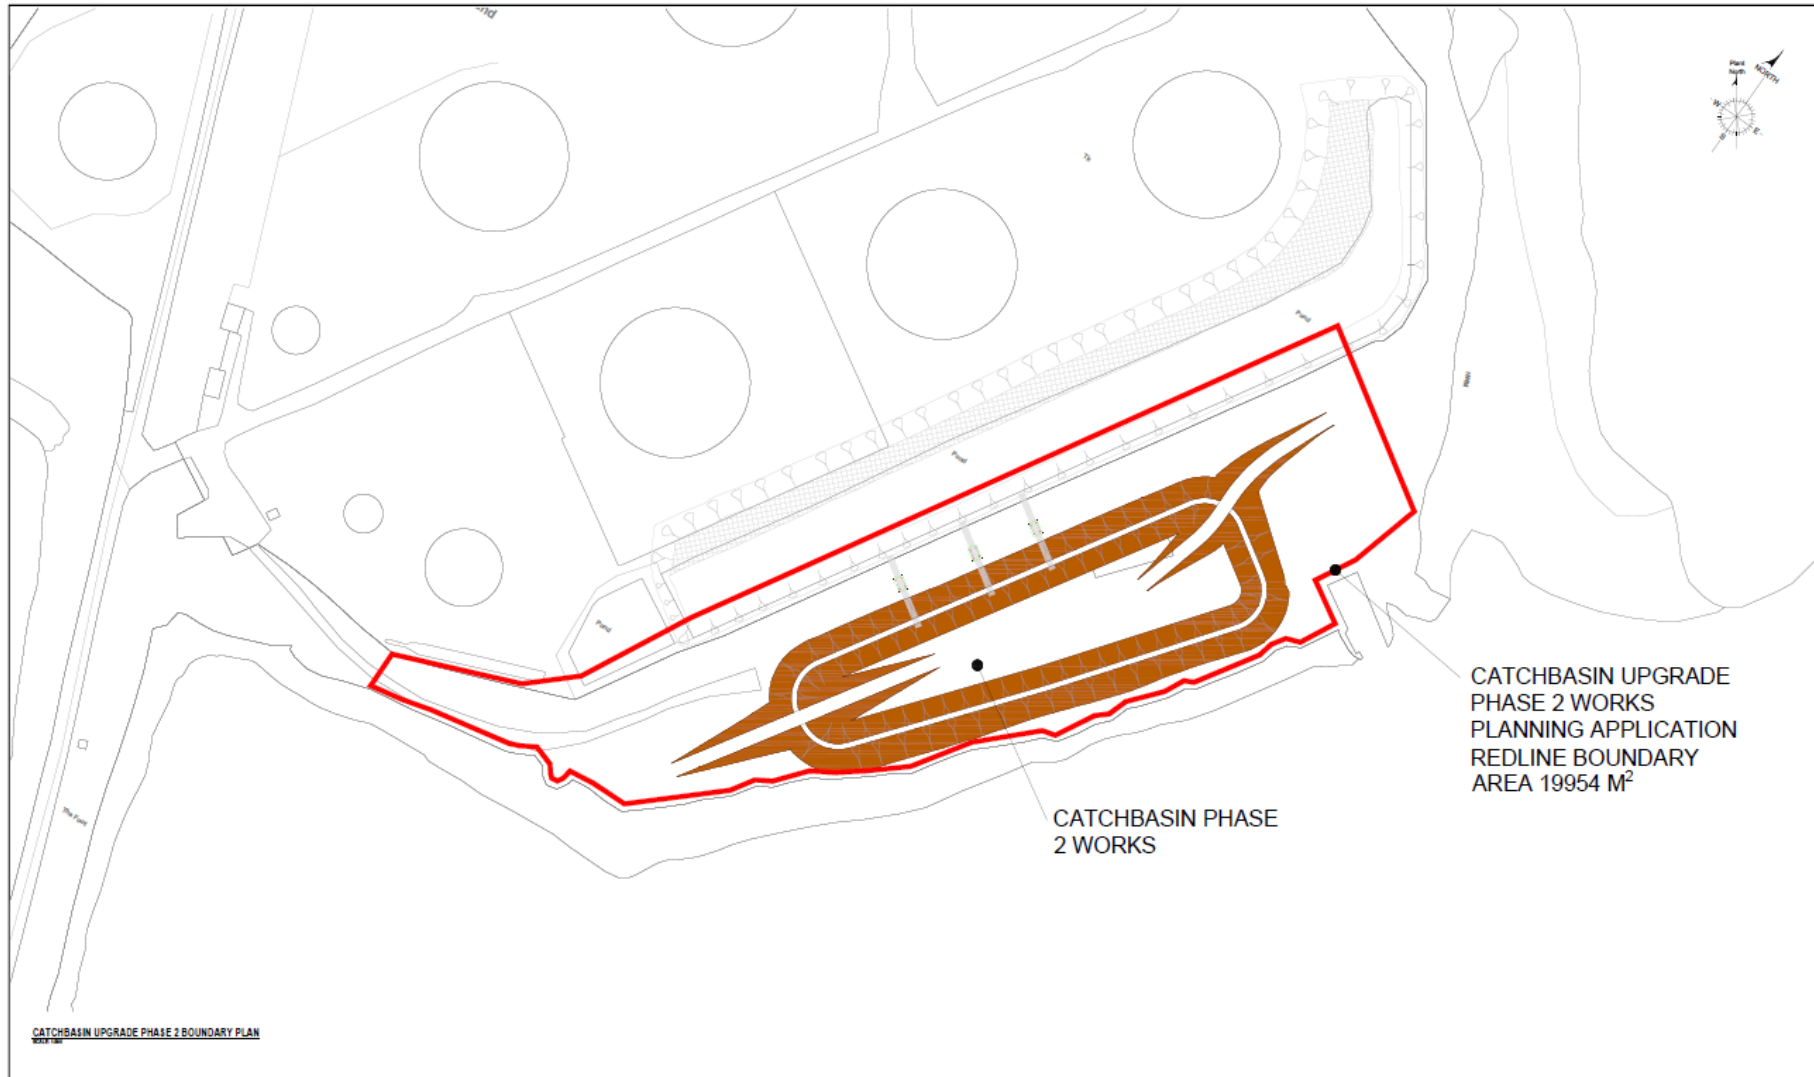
Indicative drawing of Phase 2 works (which will be subject to a future planning application)
